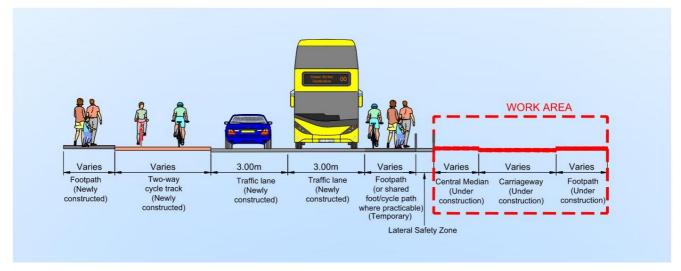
Traffic Management Cross Section, Section 1e – Stage 2
